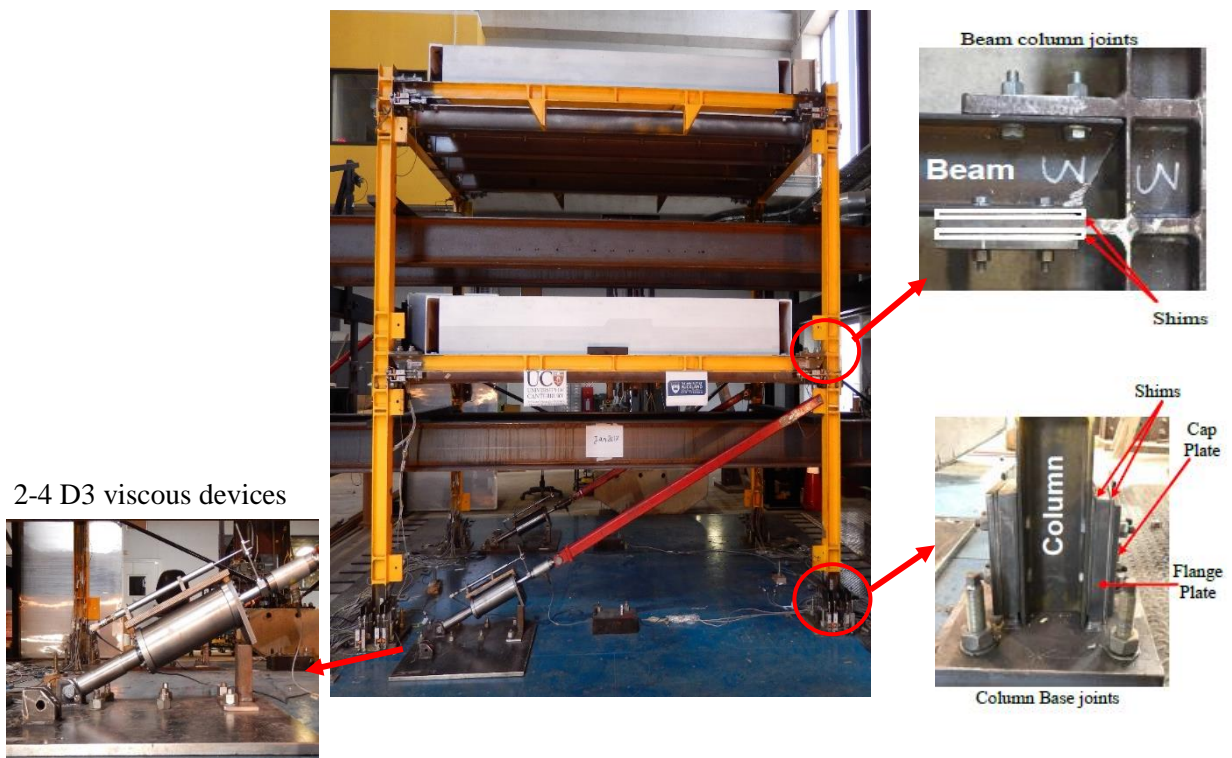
Test building constructed frame. Two steel frames with asymmetric friction connections (AFC) in the column base and beam-to-column joints. Constructed test building frame was applied with two 2-4 D3 viscous damper prototypes.
